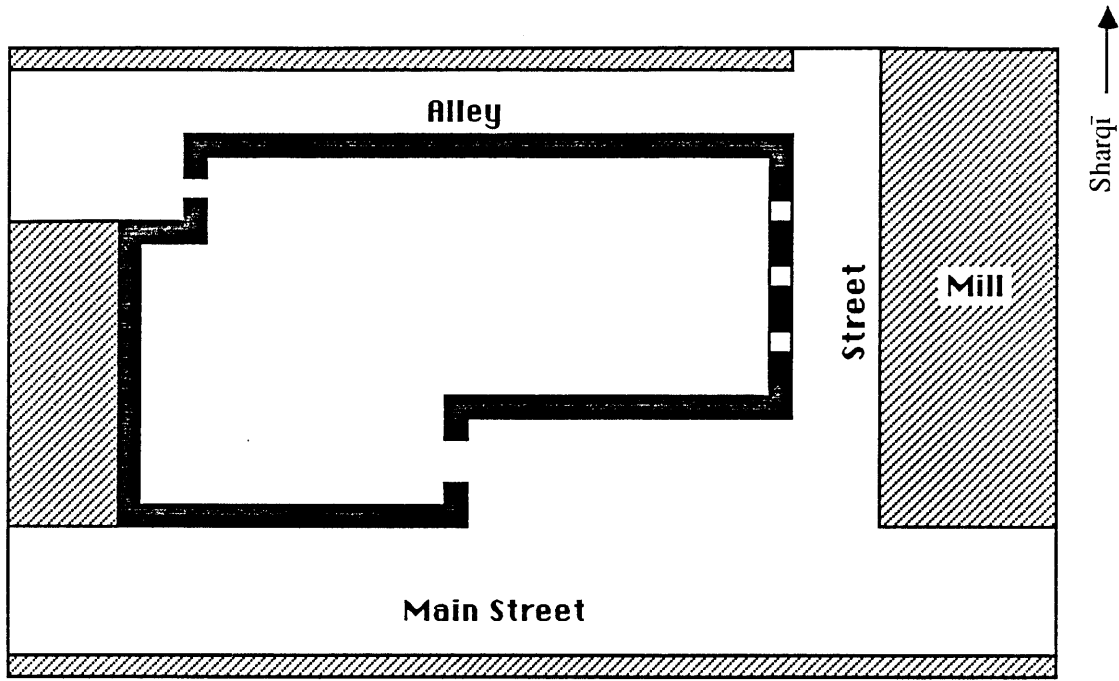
Plan of a hypothetical building with a jagged facade.
